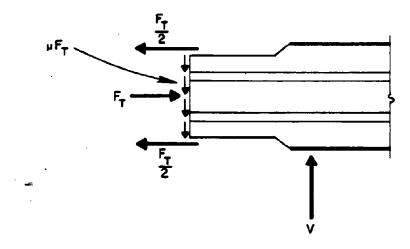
Frictional Forces on Barrier Face & hen Connection is in Shear.
